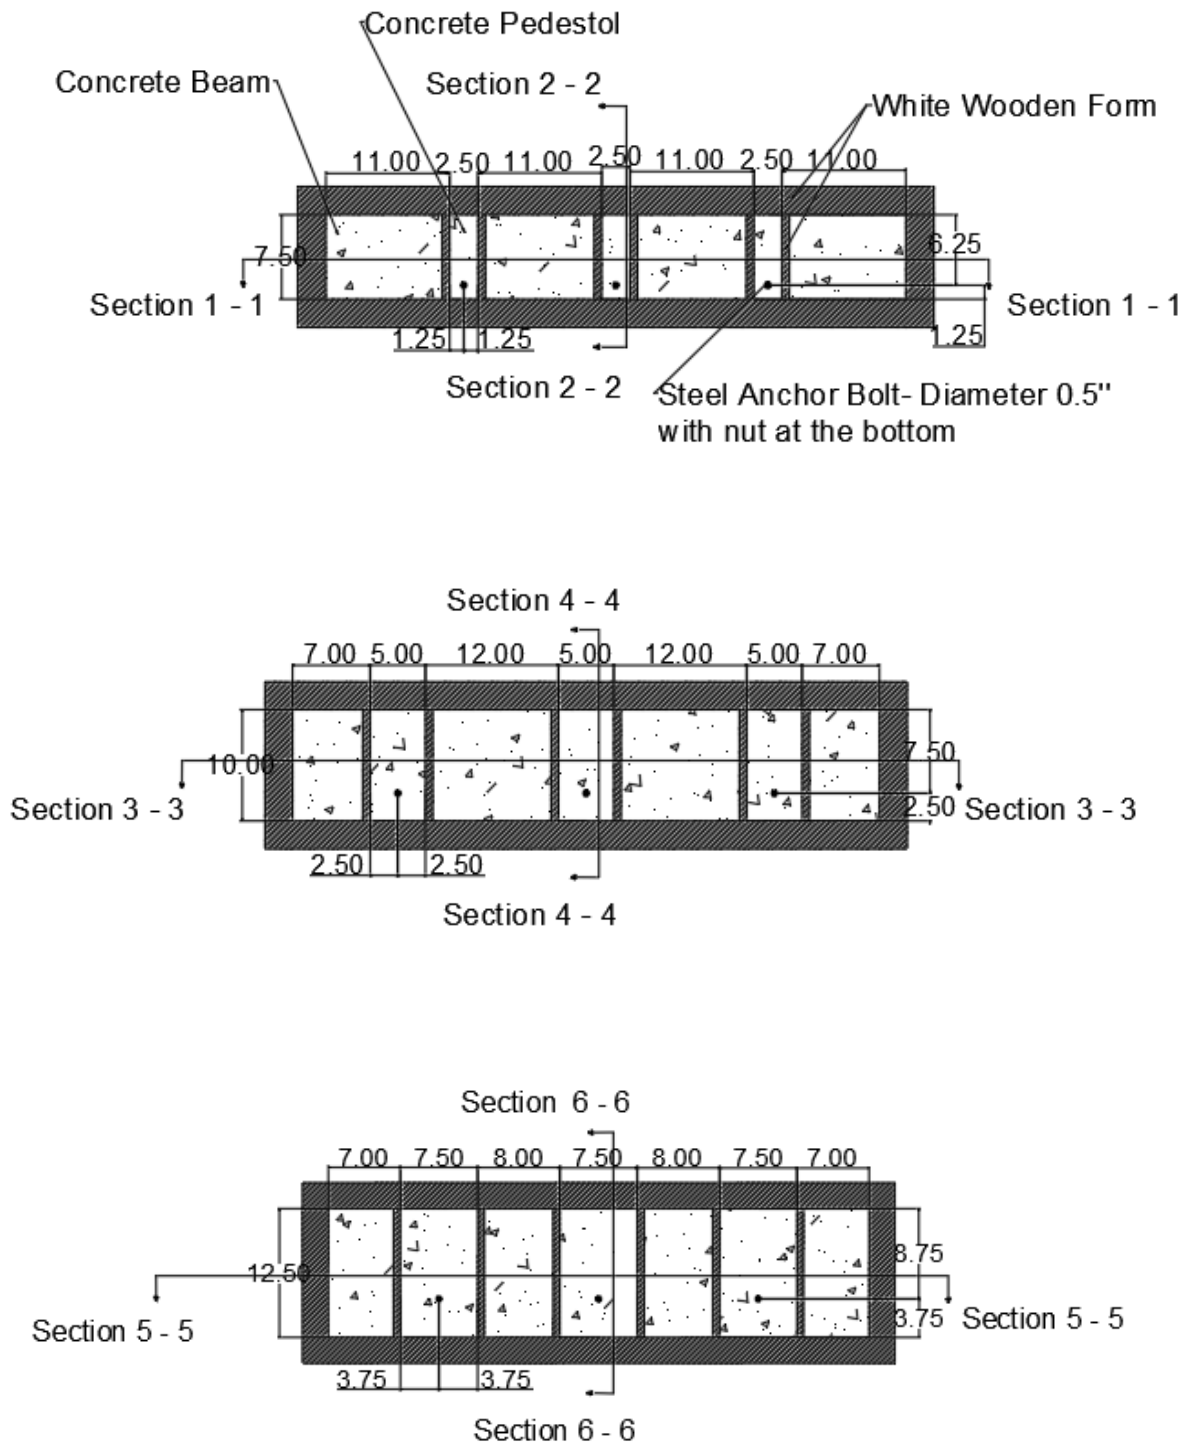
Specimen Plans View for Single Anchor Sets, all dimensions in inch.
